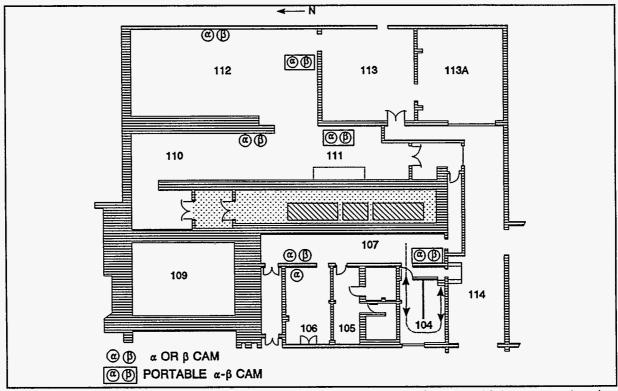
Floor plan of the HCF (Rooms 110-111, 112, and 107) areas showing recommended locations for alpha and beta CAMs.
